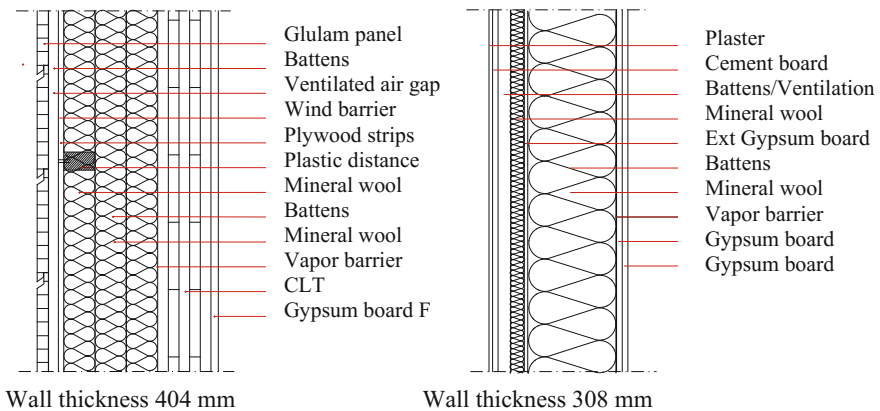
Analysed walls. To the left is CLT structure and to the right structural timber frame
